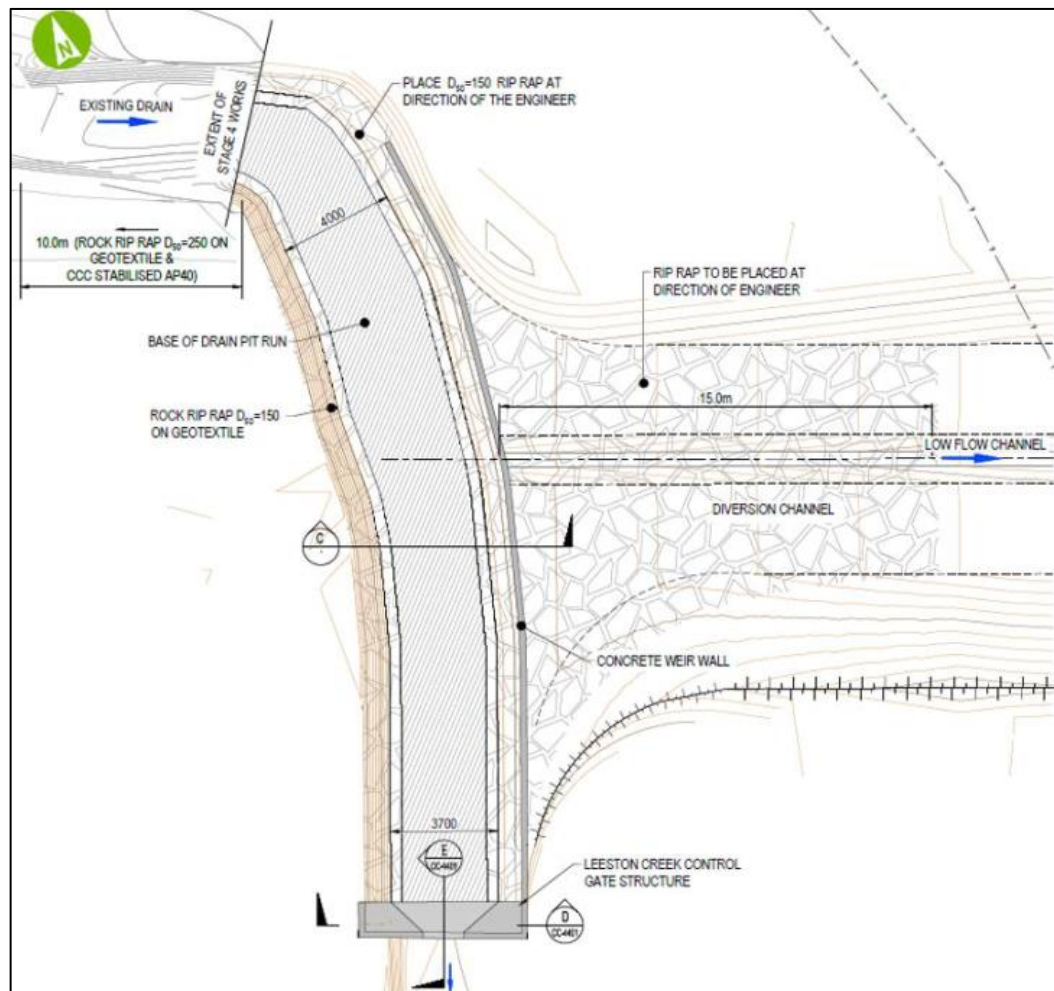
Concept plan of Diversion Structure between Leeston Creek and Stormwater Bypass Channel.
